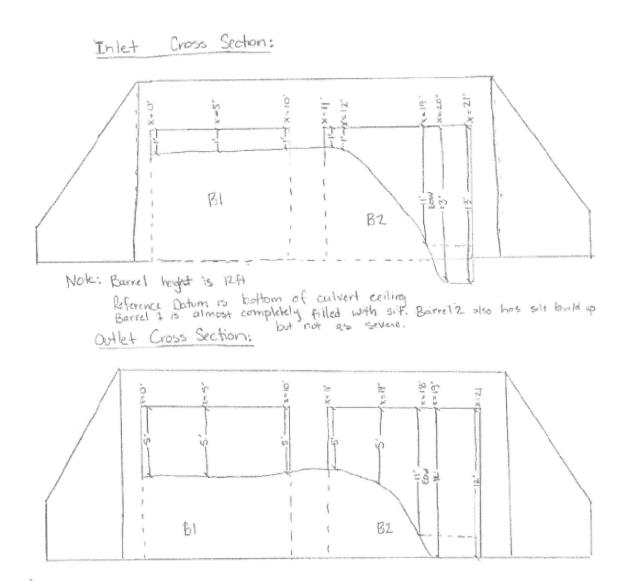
Example of a Stream Cross Sections at Bridge Fascias
